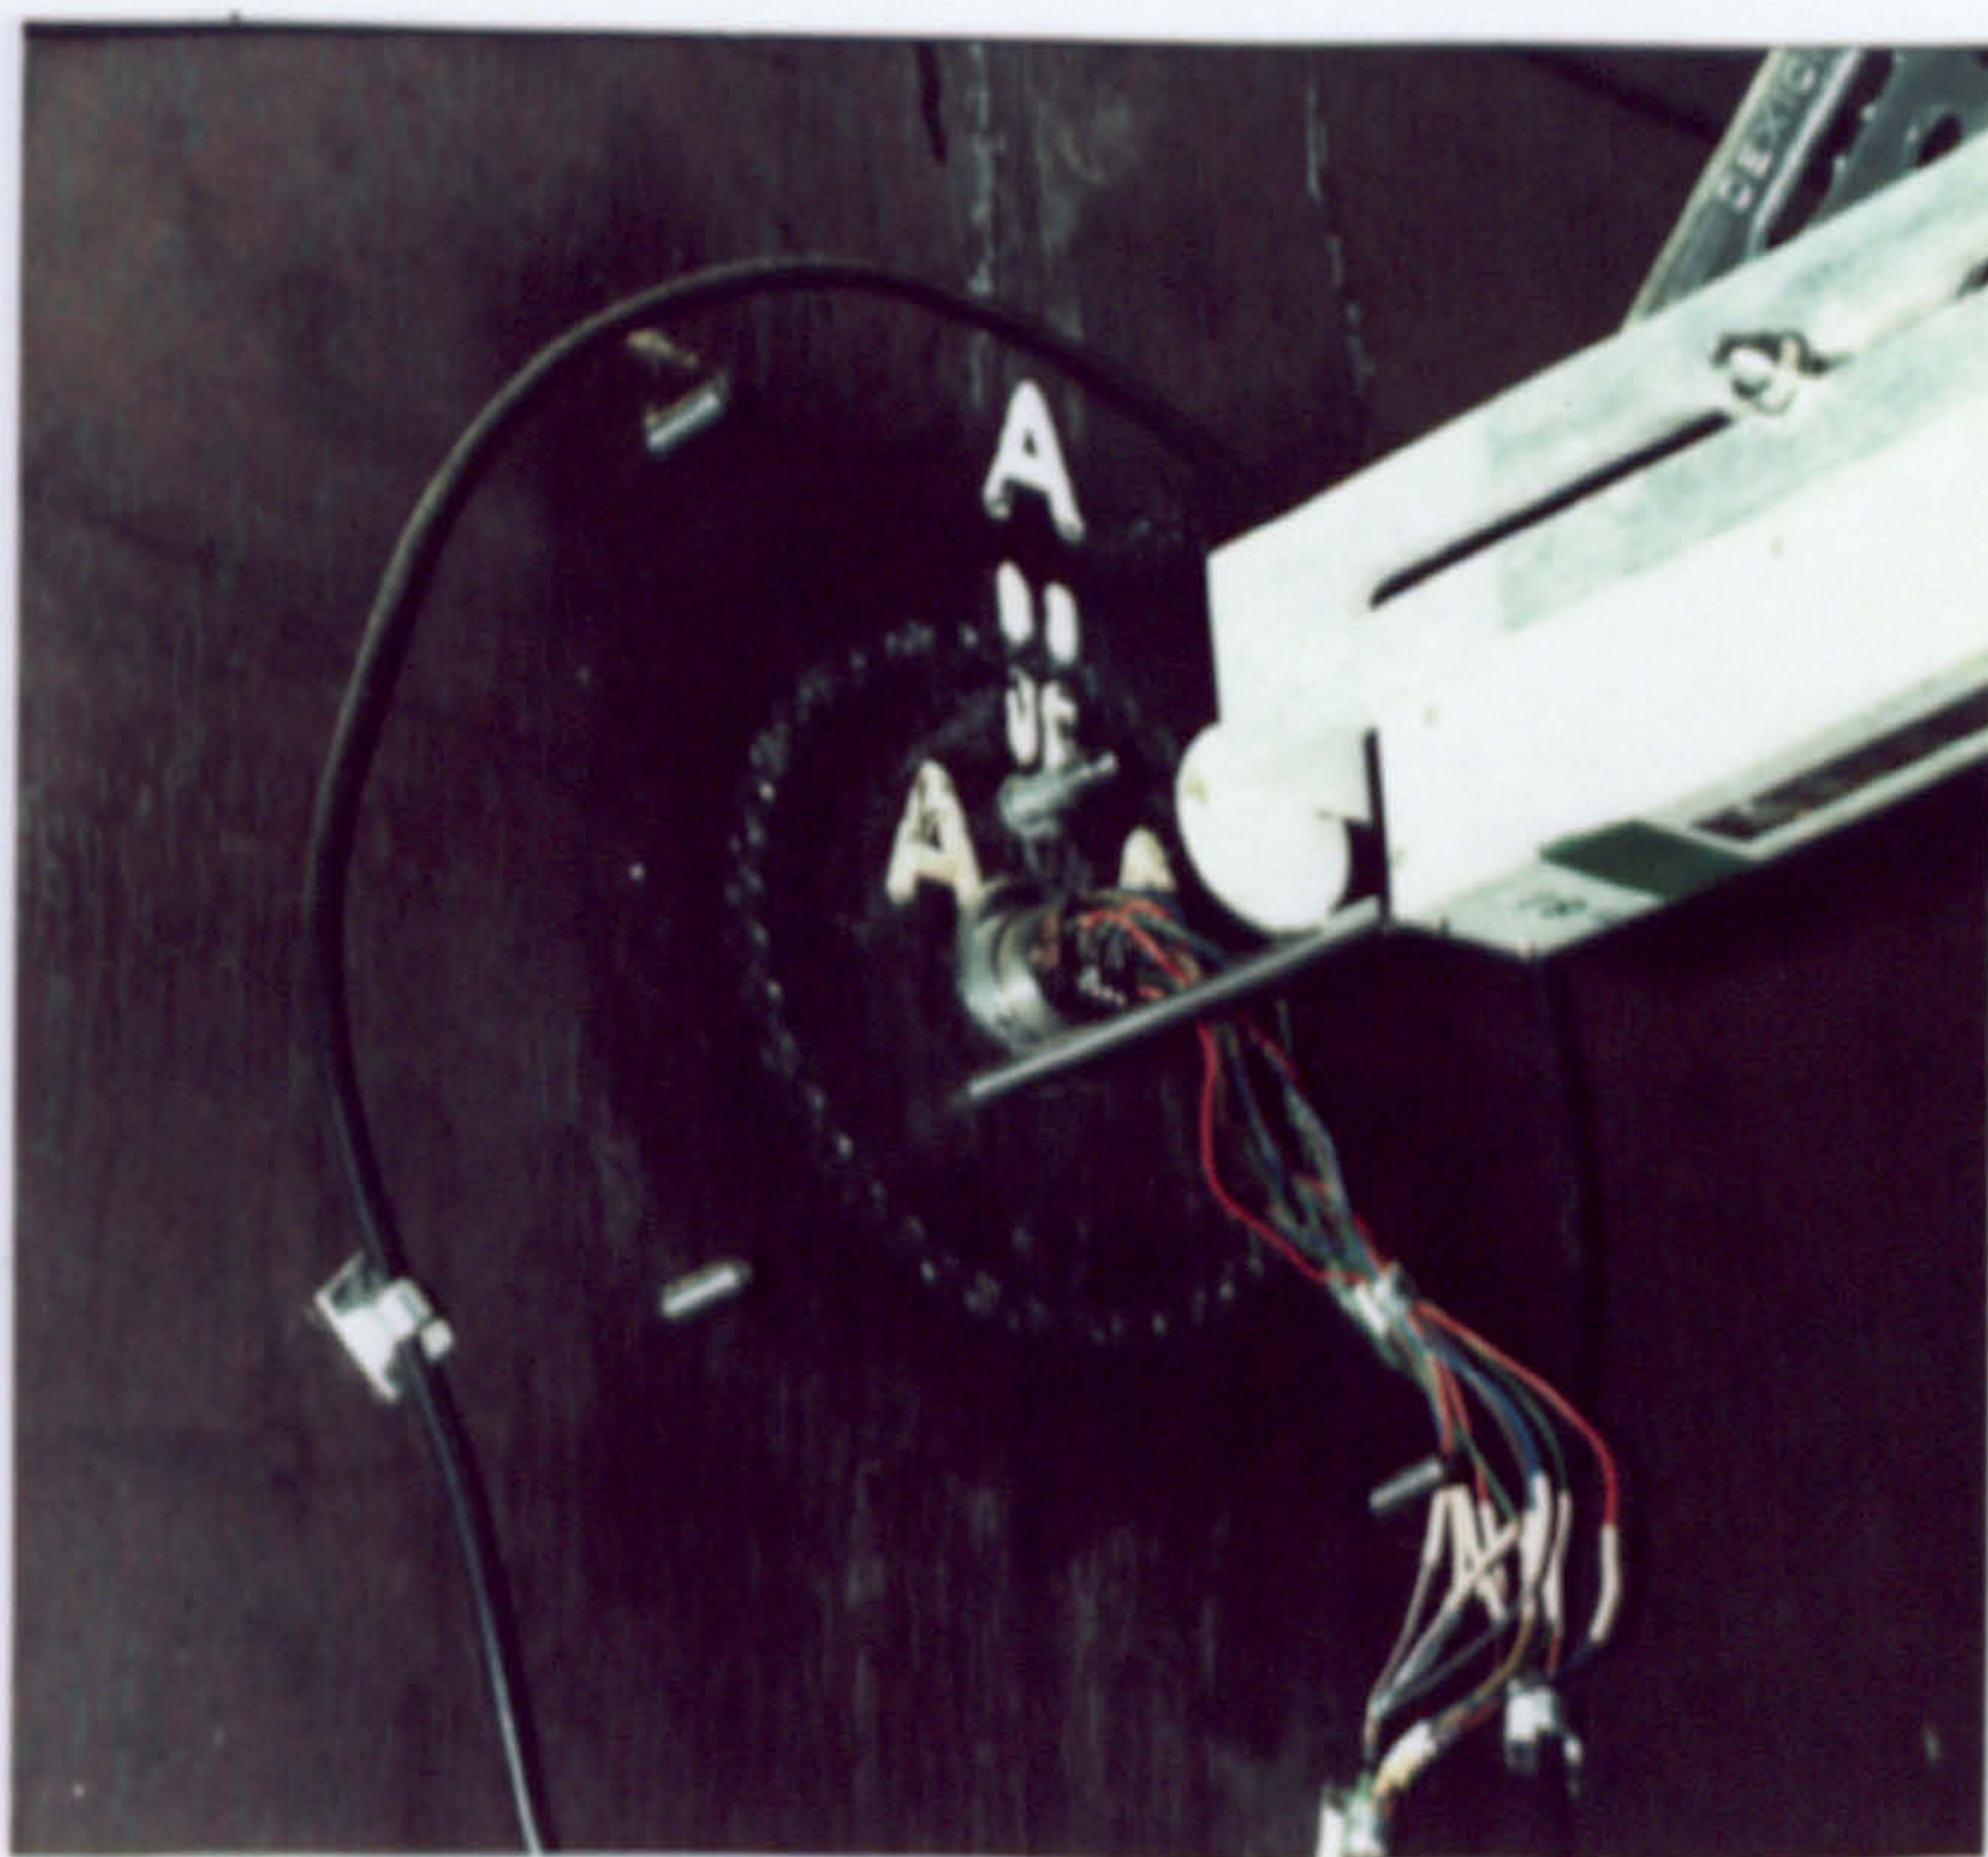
INSTALLED CELL (EXTERNAL FACE OF SILO WALL)
